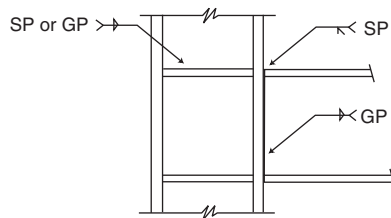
(a) Welded beam-to-column moment connection
